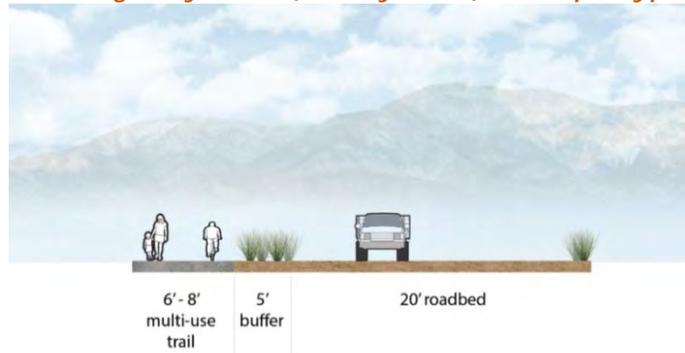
Off-Highway Trail (Utility Corridor) Concept Typical Section
